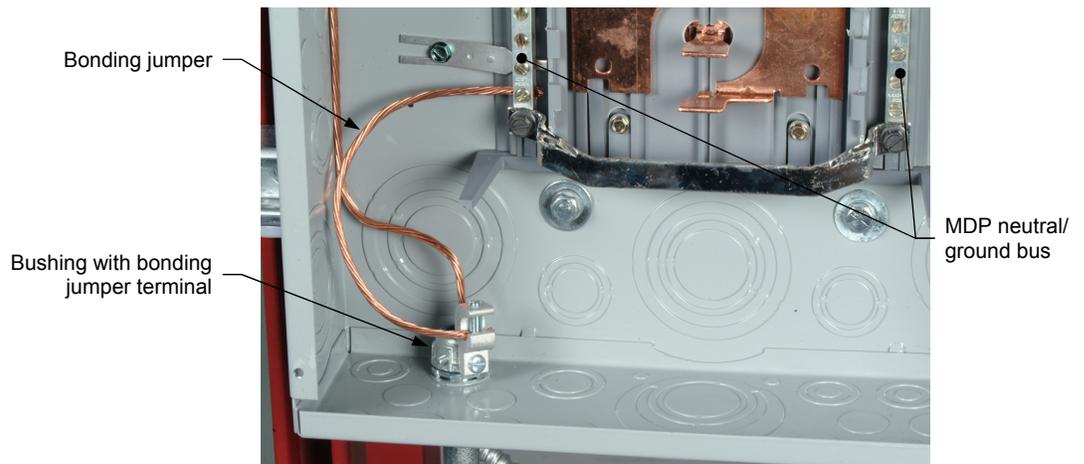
Figure C. MDP enclosures equipped with either a bonding screw or a main bonding jumper (MBJ).
